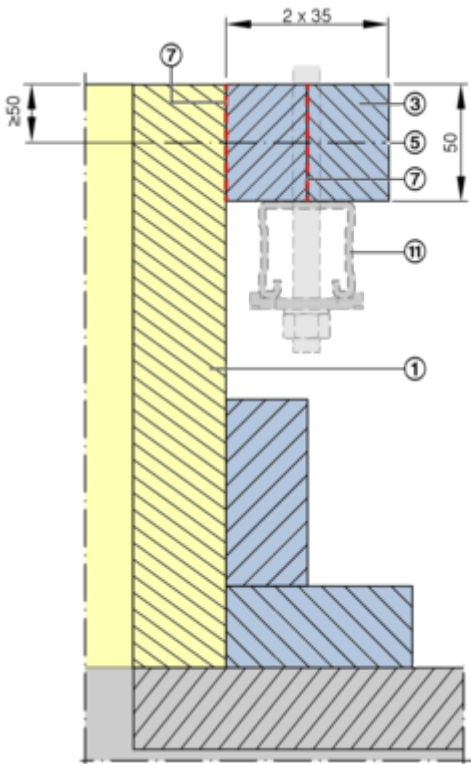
Installation detail H: Fastening the suspension for horizontal damper position
